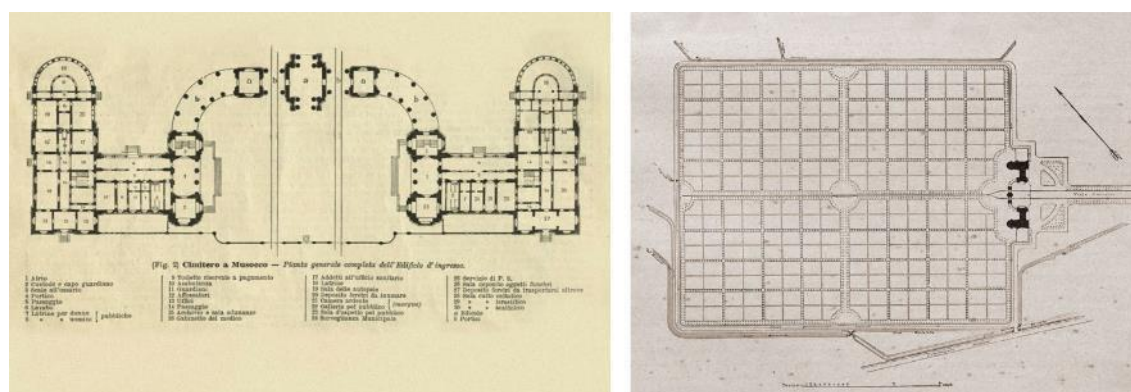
Plan of Auxiliary Buildings, Cimitero a Musocco, 1895 (Left); Site Plan (Right)
